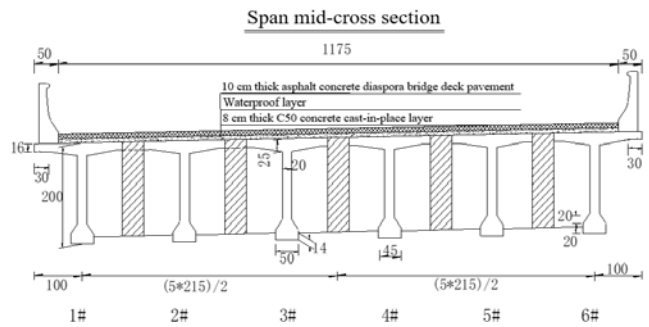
Cross-sectional drawing of prestressed continuous T-girder bridge (unit: cm)
